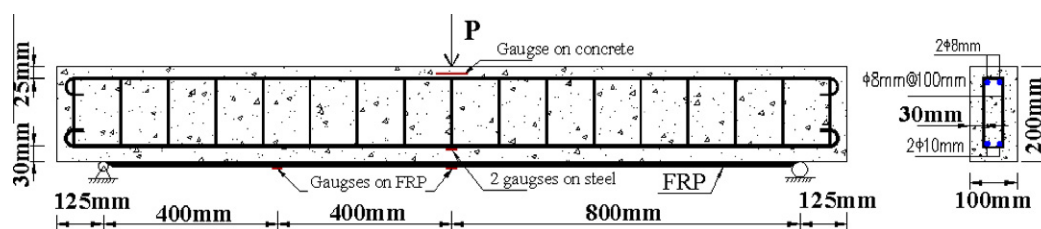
Concrete beam-geometry, reinforcement and instrumentation details.
